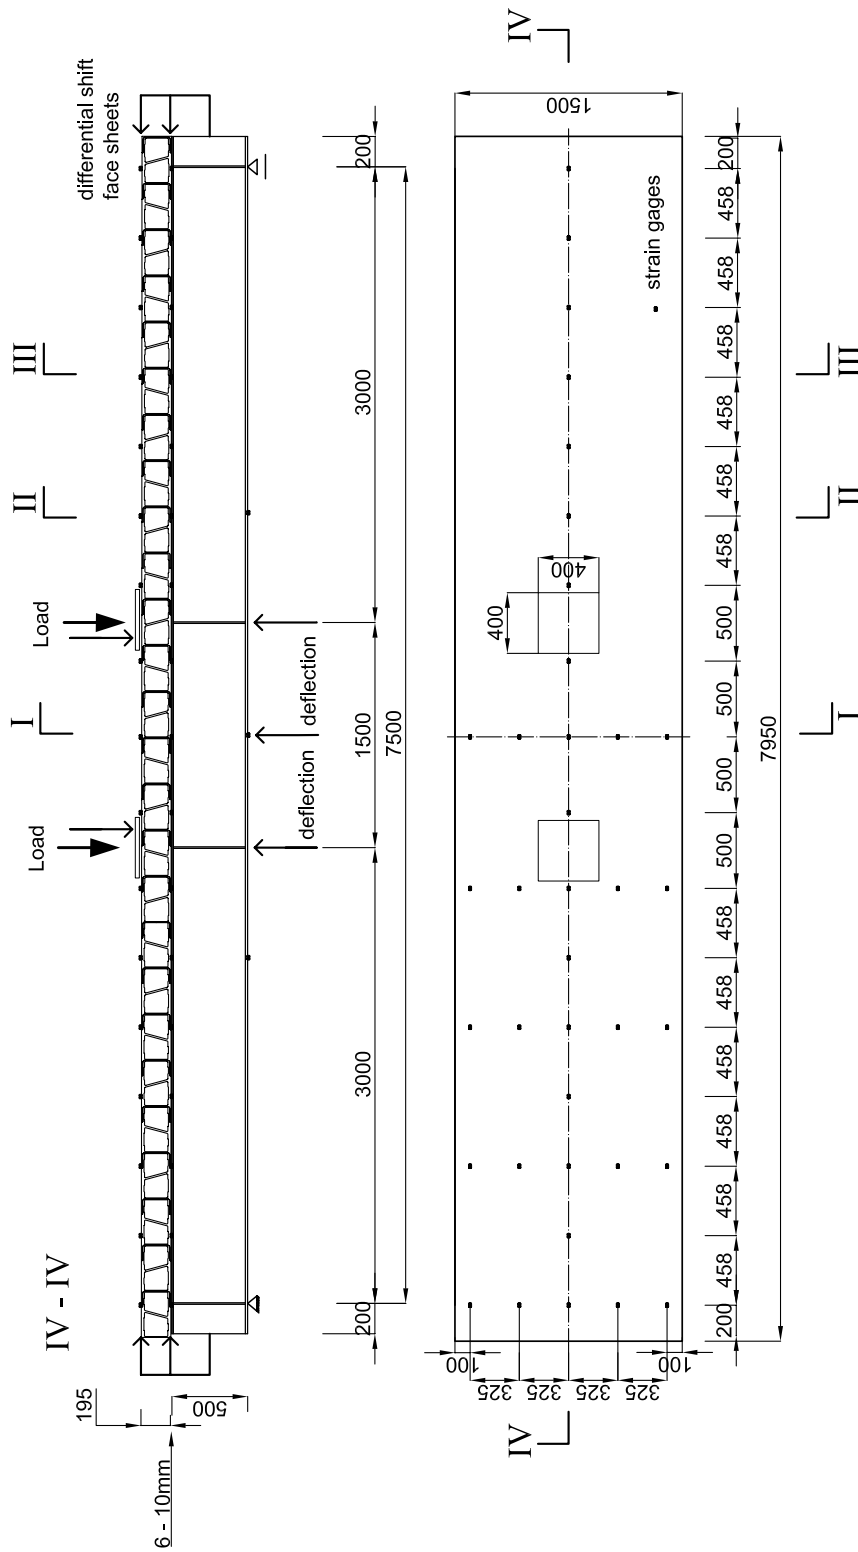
Set-up, elevation and top view of DuraSpan girder.
